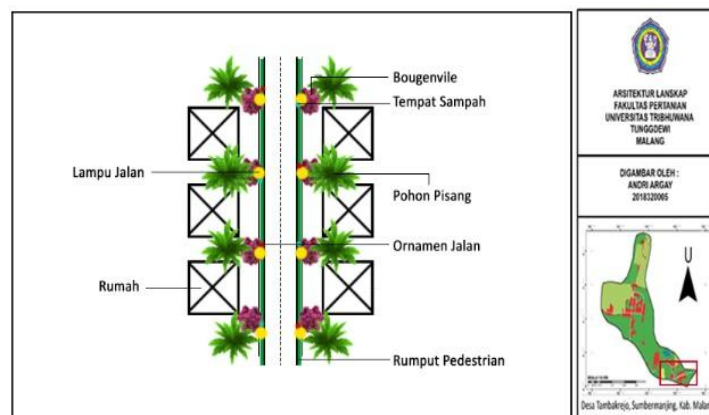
Road Site Plan of the Southern Part of Sendang Biru Hamlet
